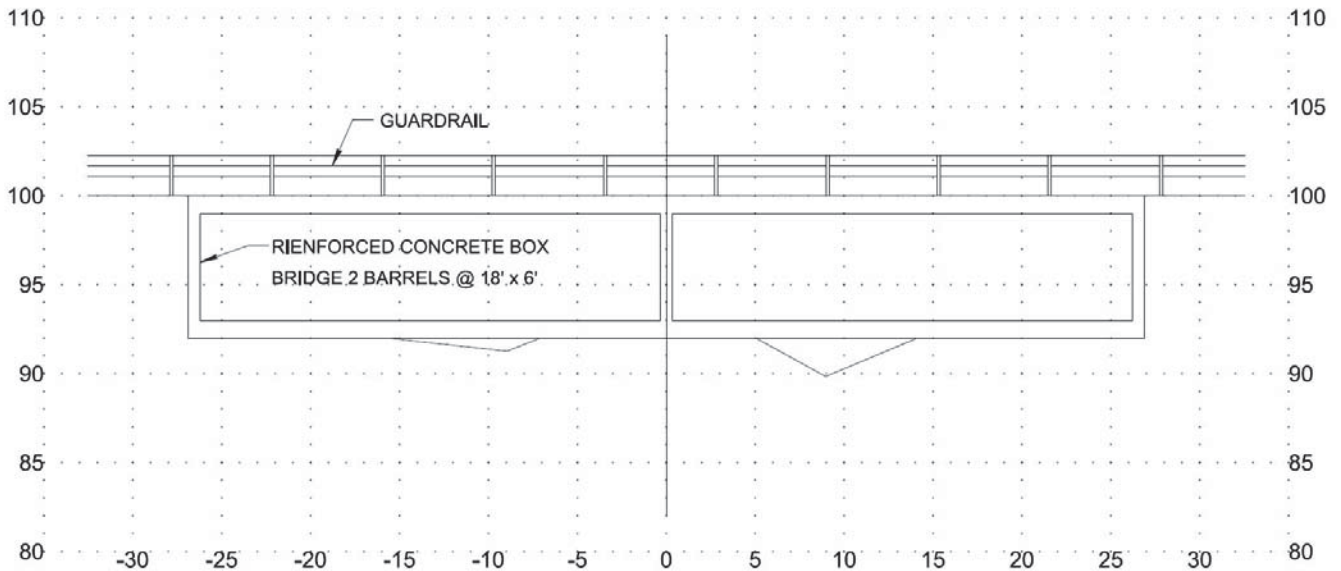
Shows profile of the replacement bridge according to TIR dated 03/27/2018.
